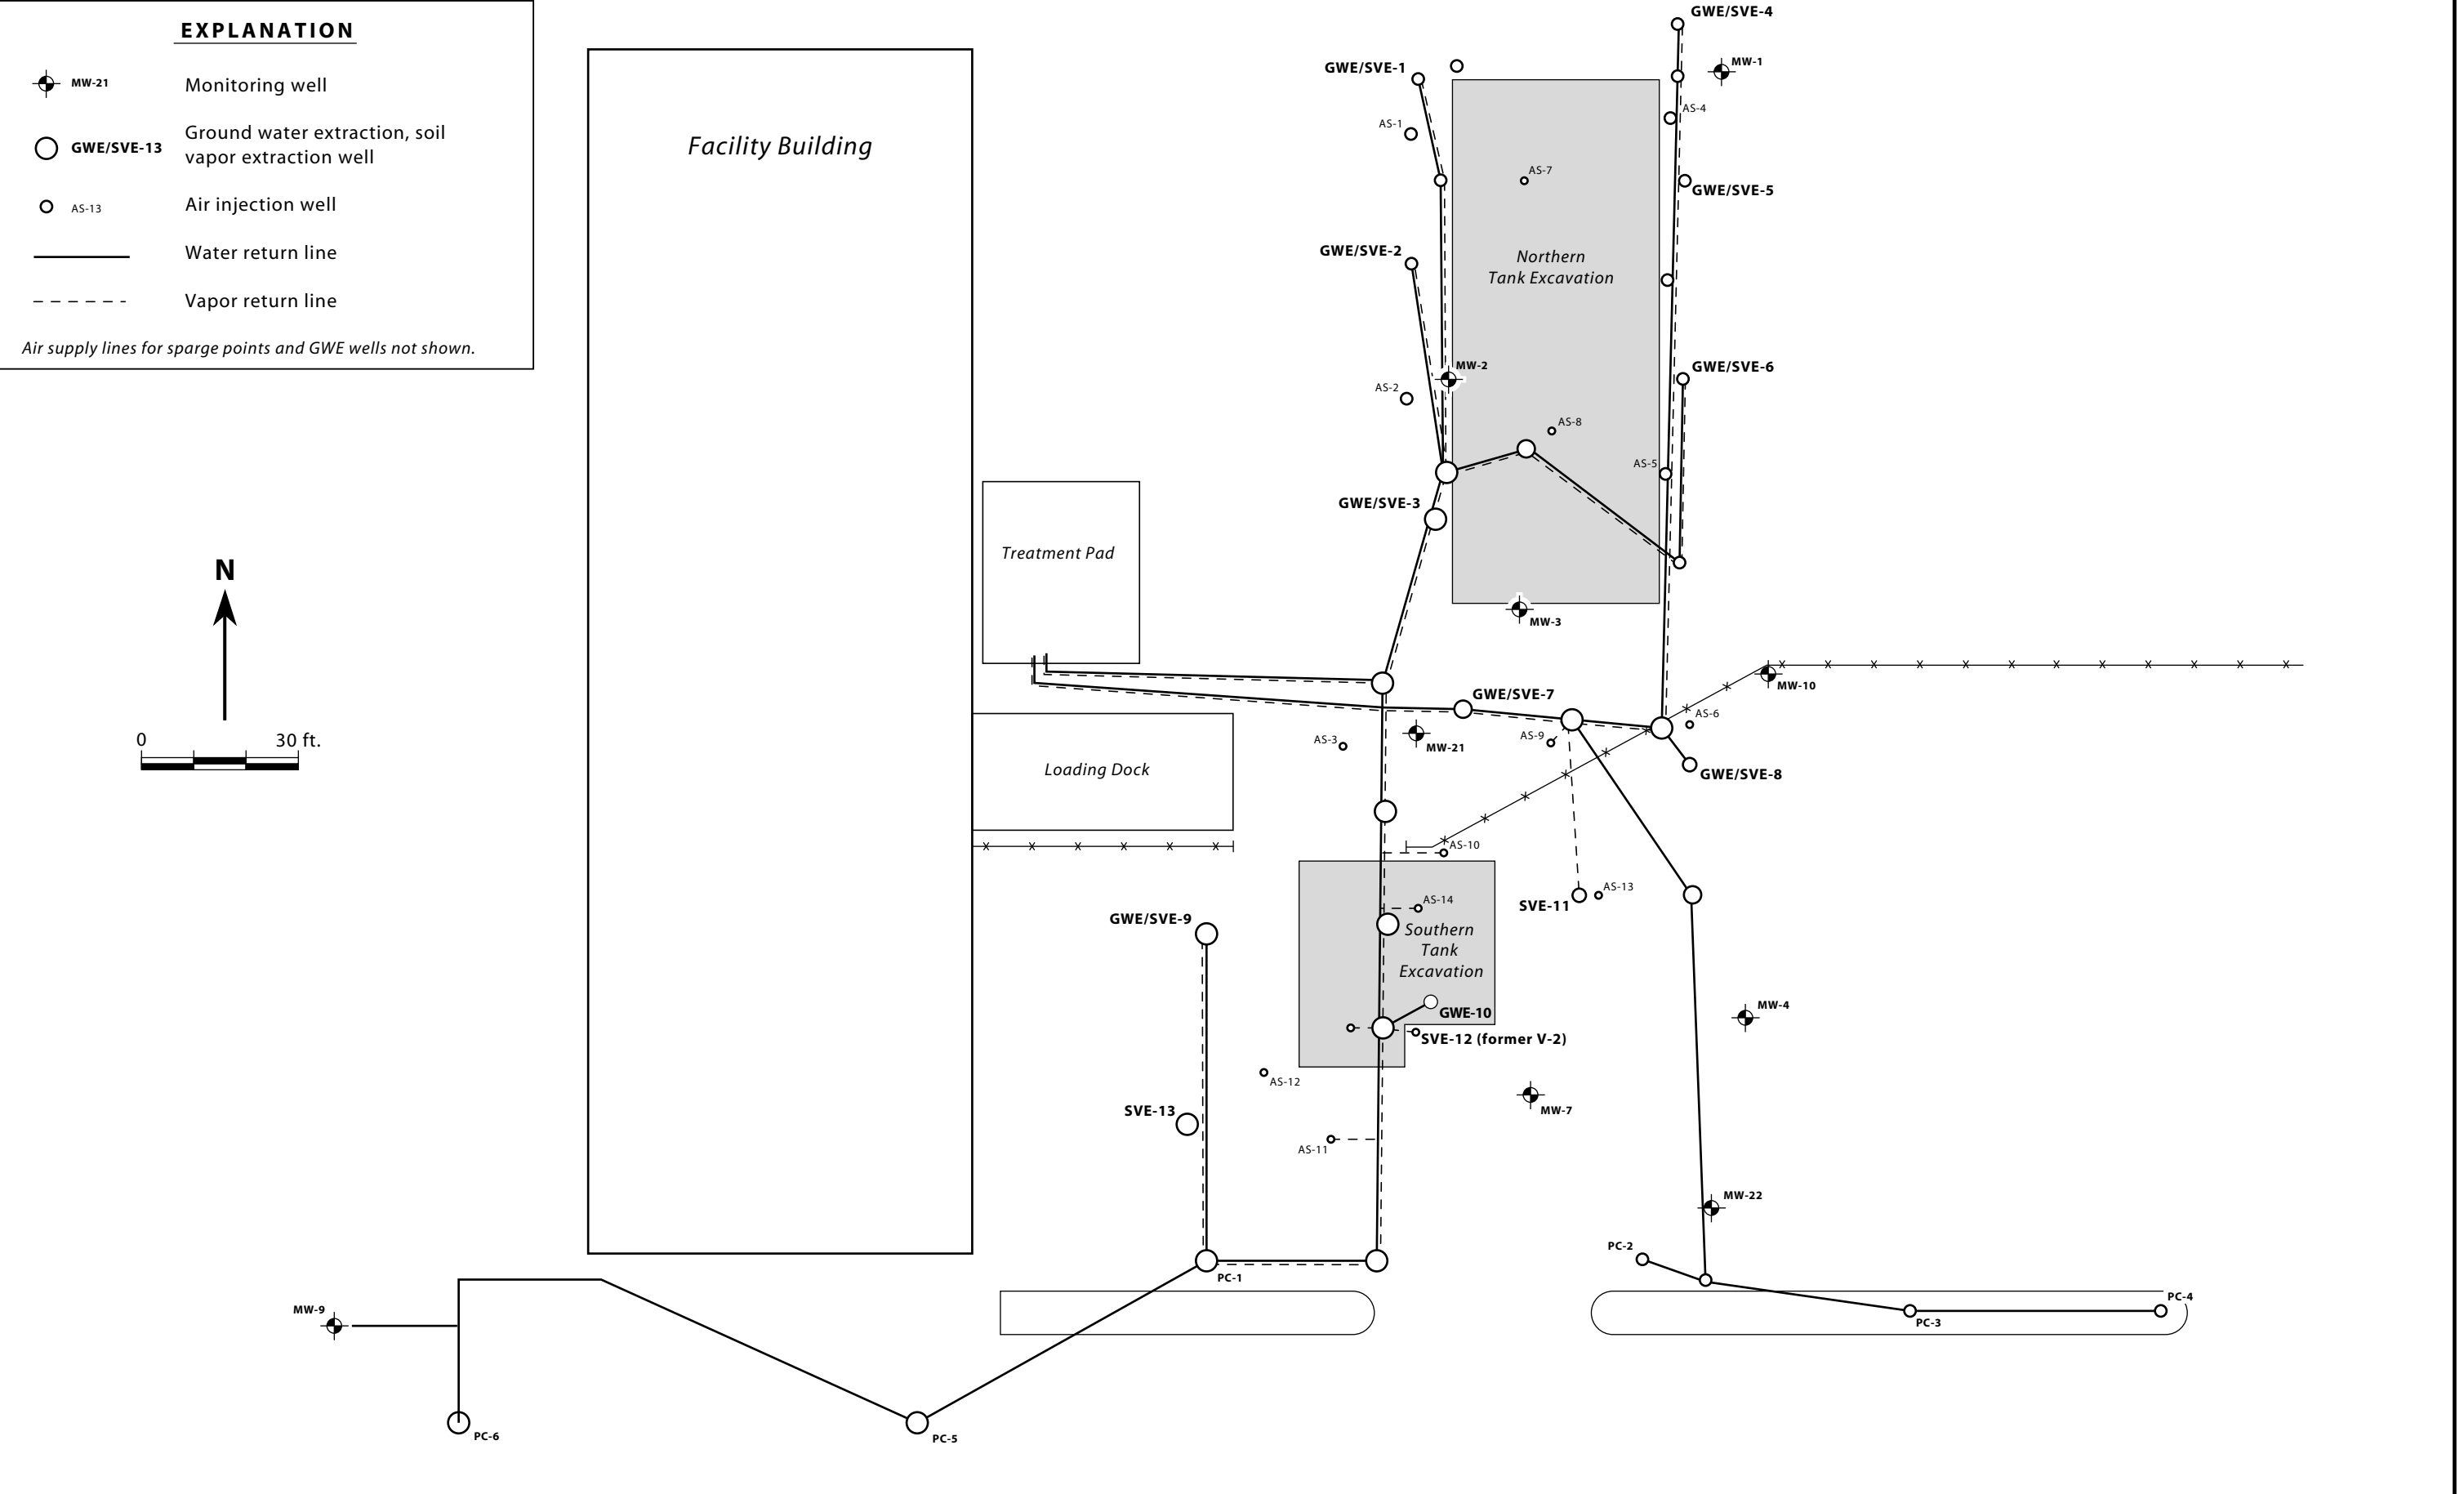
Remediation System - Plan View - 455 Yolanda Avenue, Santa Rosa, California
